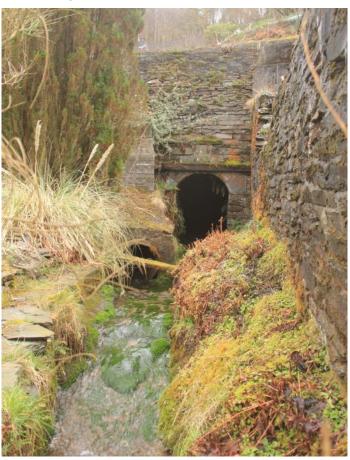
View east of the entrance to Level Fawr adit (PRN 57523 / 96529, Listed Building ref.10694). The later culvert lies on the left, and enclosure wall LF03 on the right.
